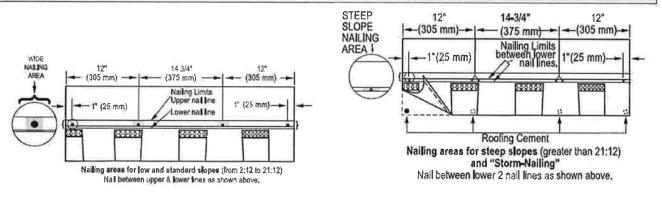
When installing Grand Manor Shangles on steep slopes, use seven nails and three spots of asphalt roofing cement.
